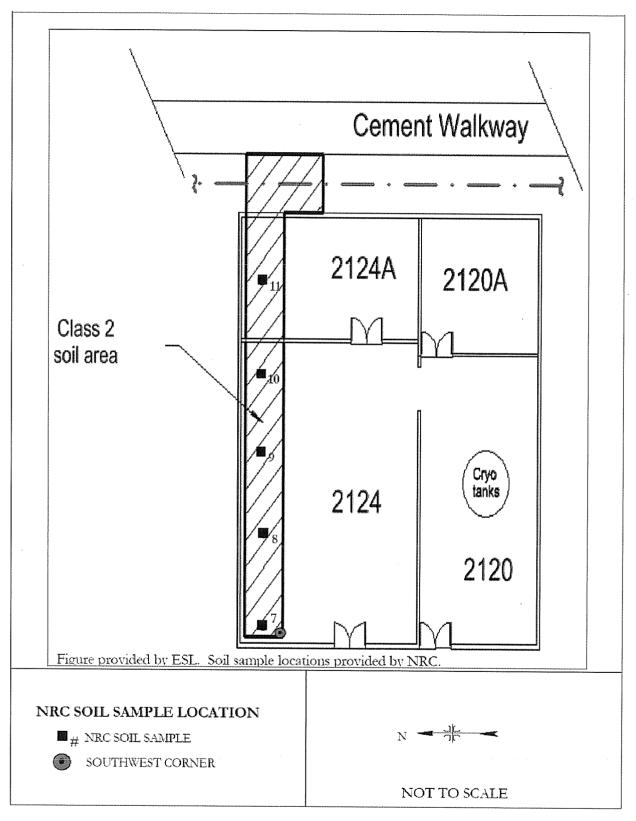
Interior Excavation - NRC Soil Sample Locations
